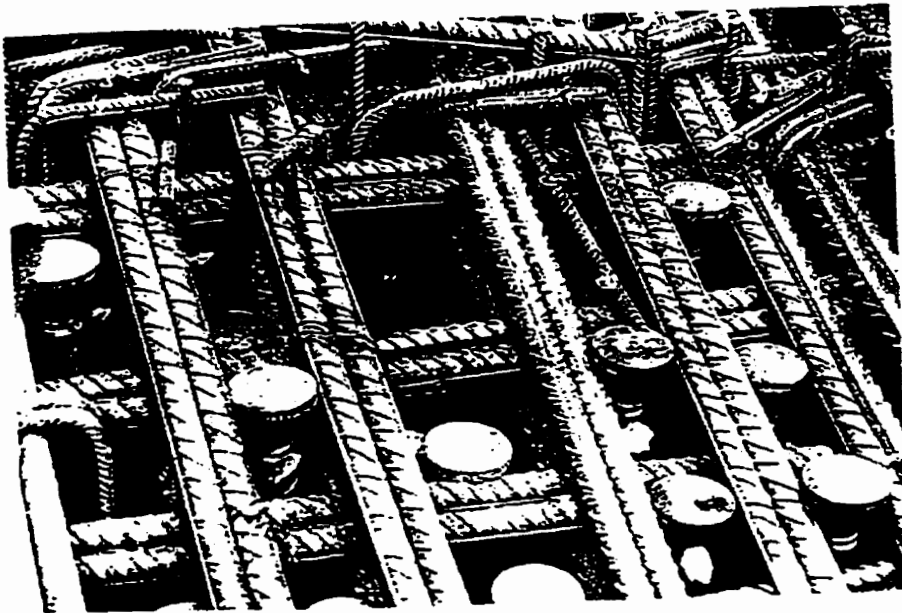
Reinforcement of Shell Element for an Offshore Platform (23)
